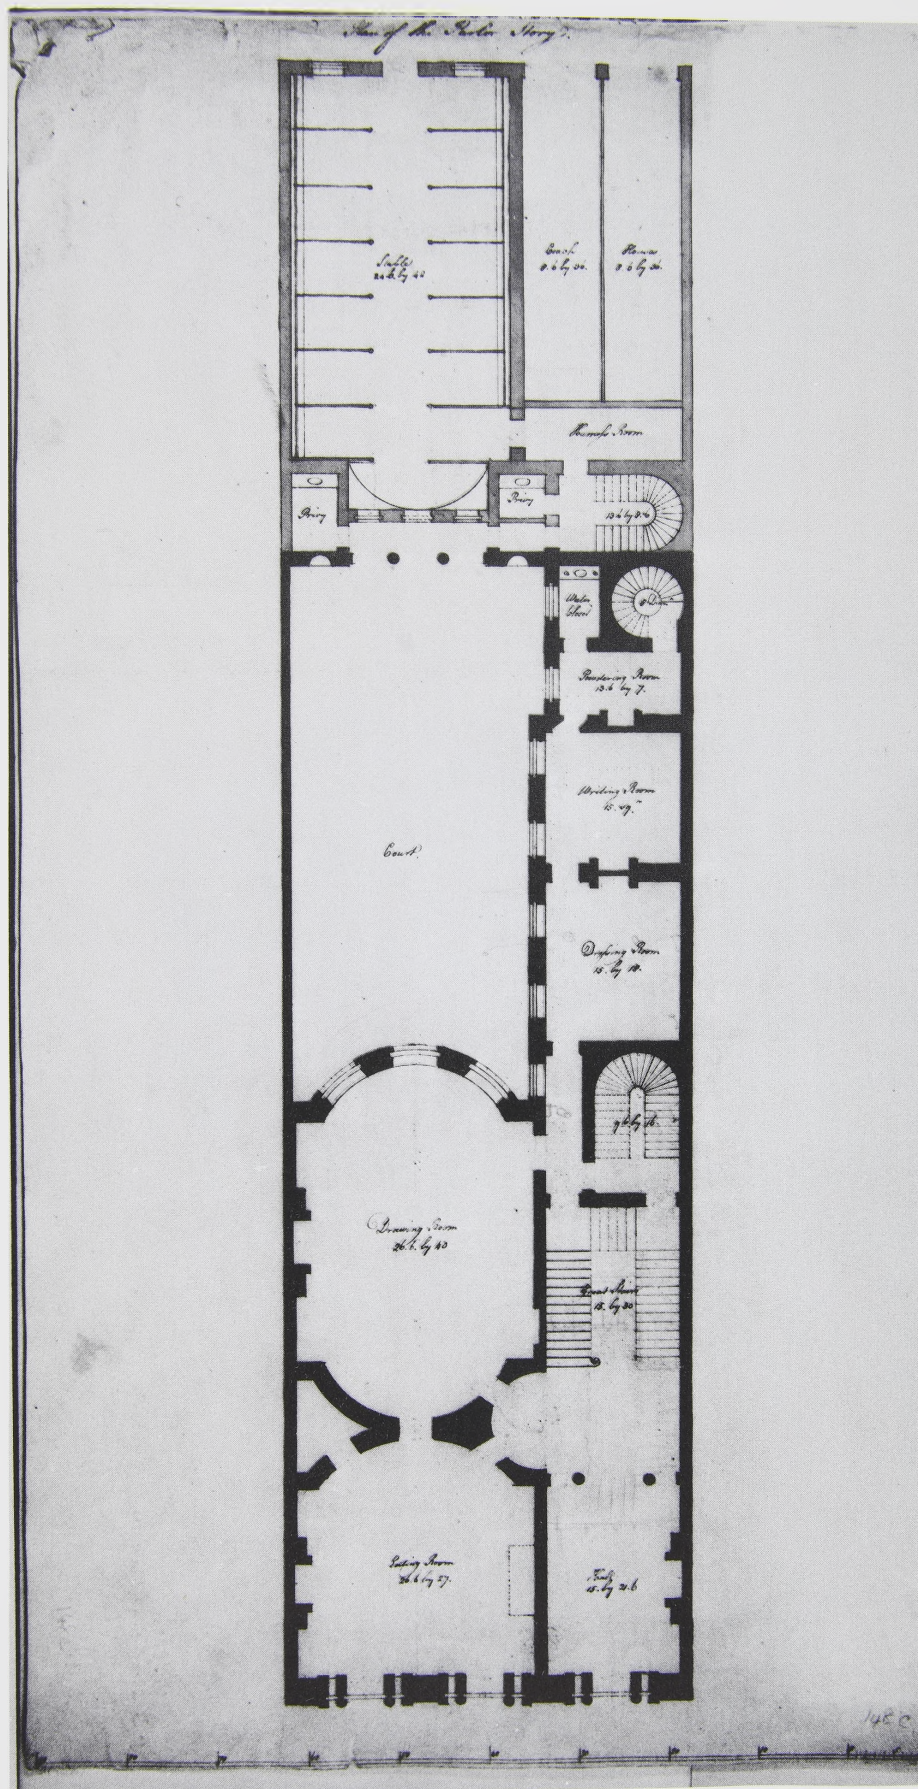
Robert Adam. London, No. 20 St James's Square: Plan of the parlour storey, 1772
